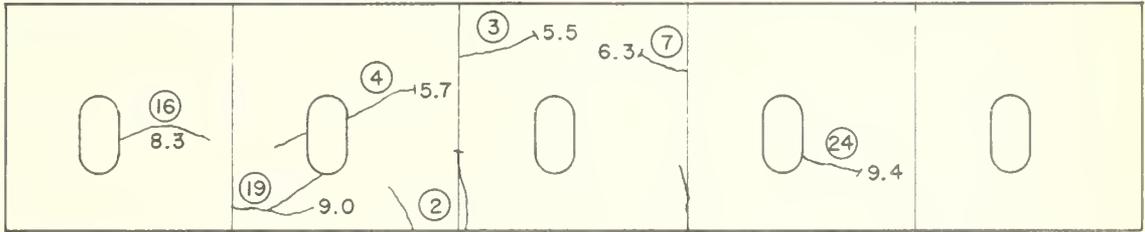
CRACK PATTERN IN BEAM NO. 4
